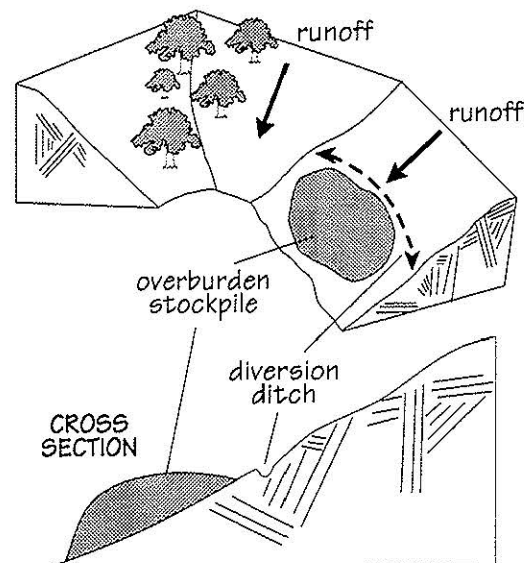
A diversion ditch can be placed upslope from an overburden pile to prevent saturation of the pile.
